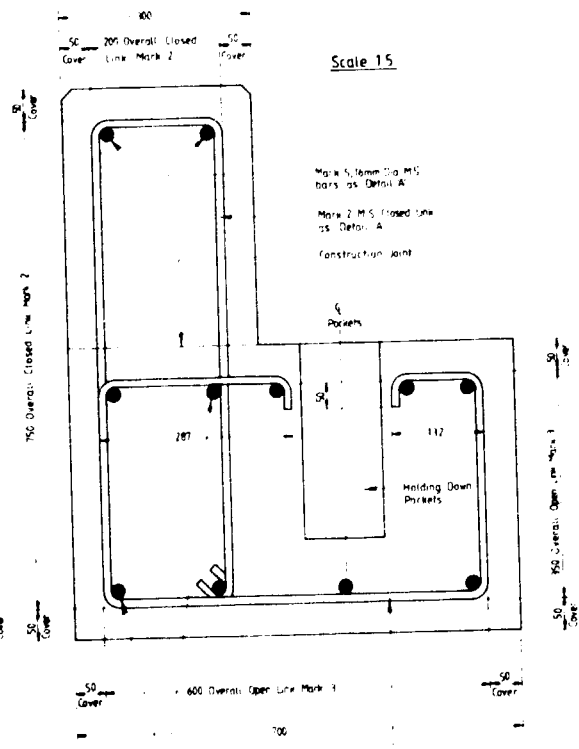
DETAIL 'A' - SECTION ON CONCRETE PIER CAP SHOWING REINFORCEMENT BETWEEN HOLDING DOWN POCKETS.
